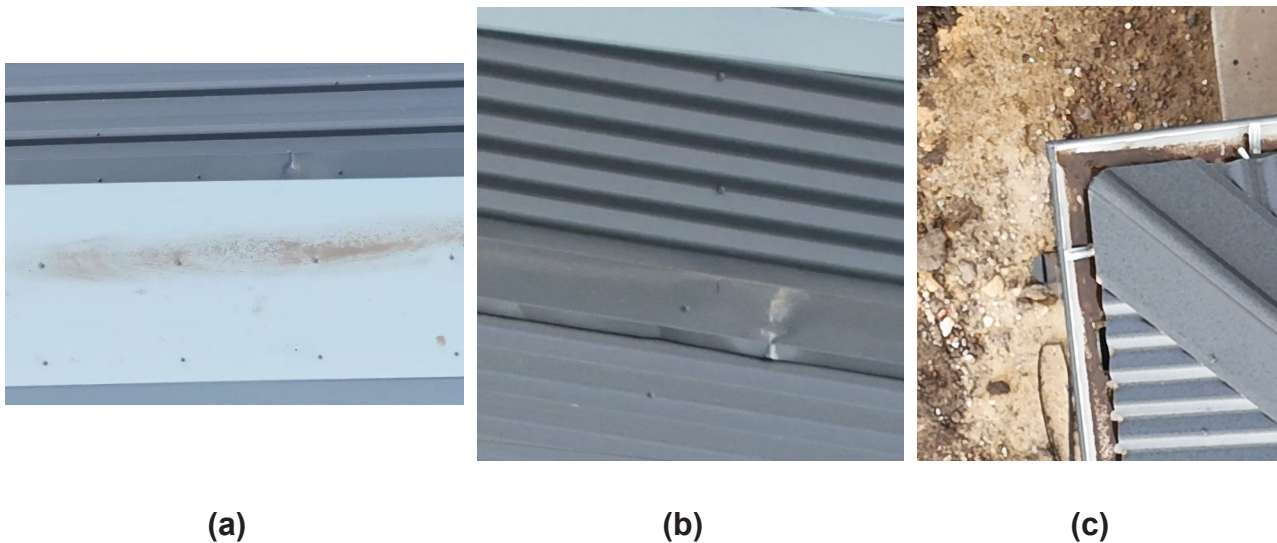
Roof plumbing issues found in case studies 1 and 2: (a) stains left on flashing and/or metal roof sheets by rain, (b) bending or damage to metal roof sheet, (c) water ponding in gutters due to insufficient gradients
